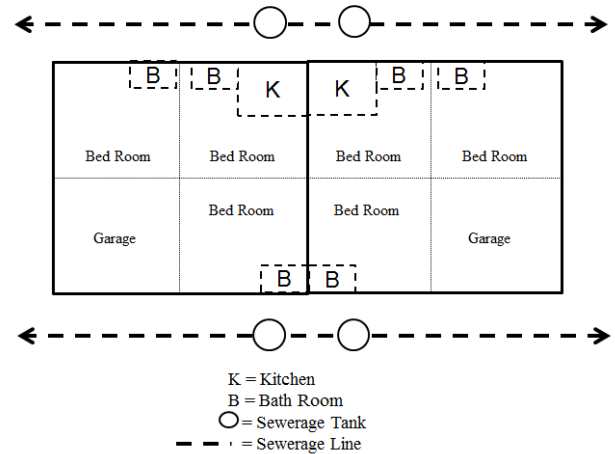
Line plan of damaged buildings showing layout of utilities and location of bathrooms and kitchens
